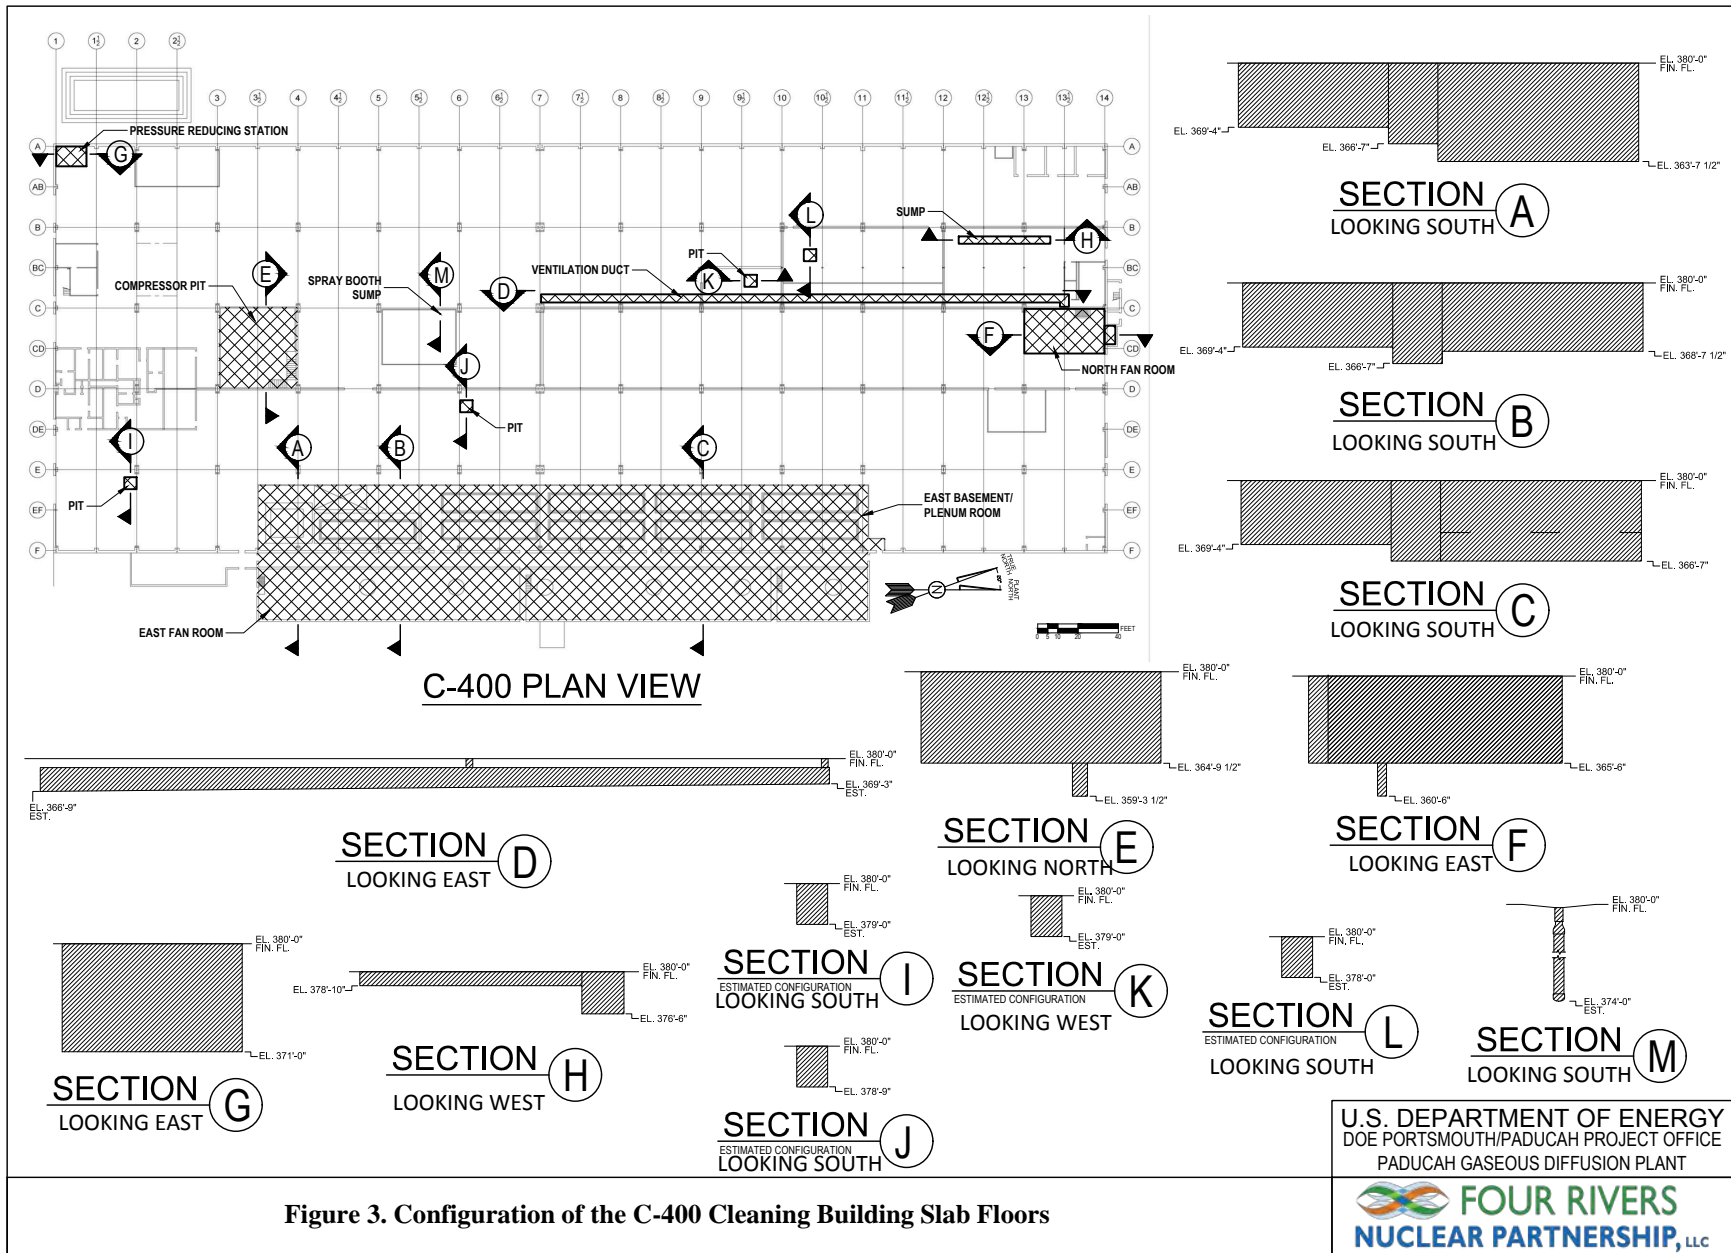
Configuration of the C-400 Cleaning Building Slab Floors
